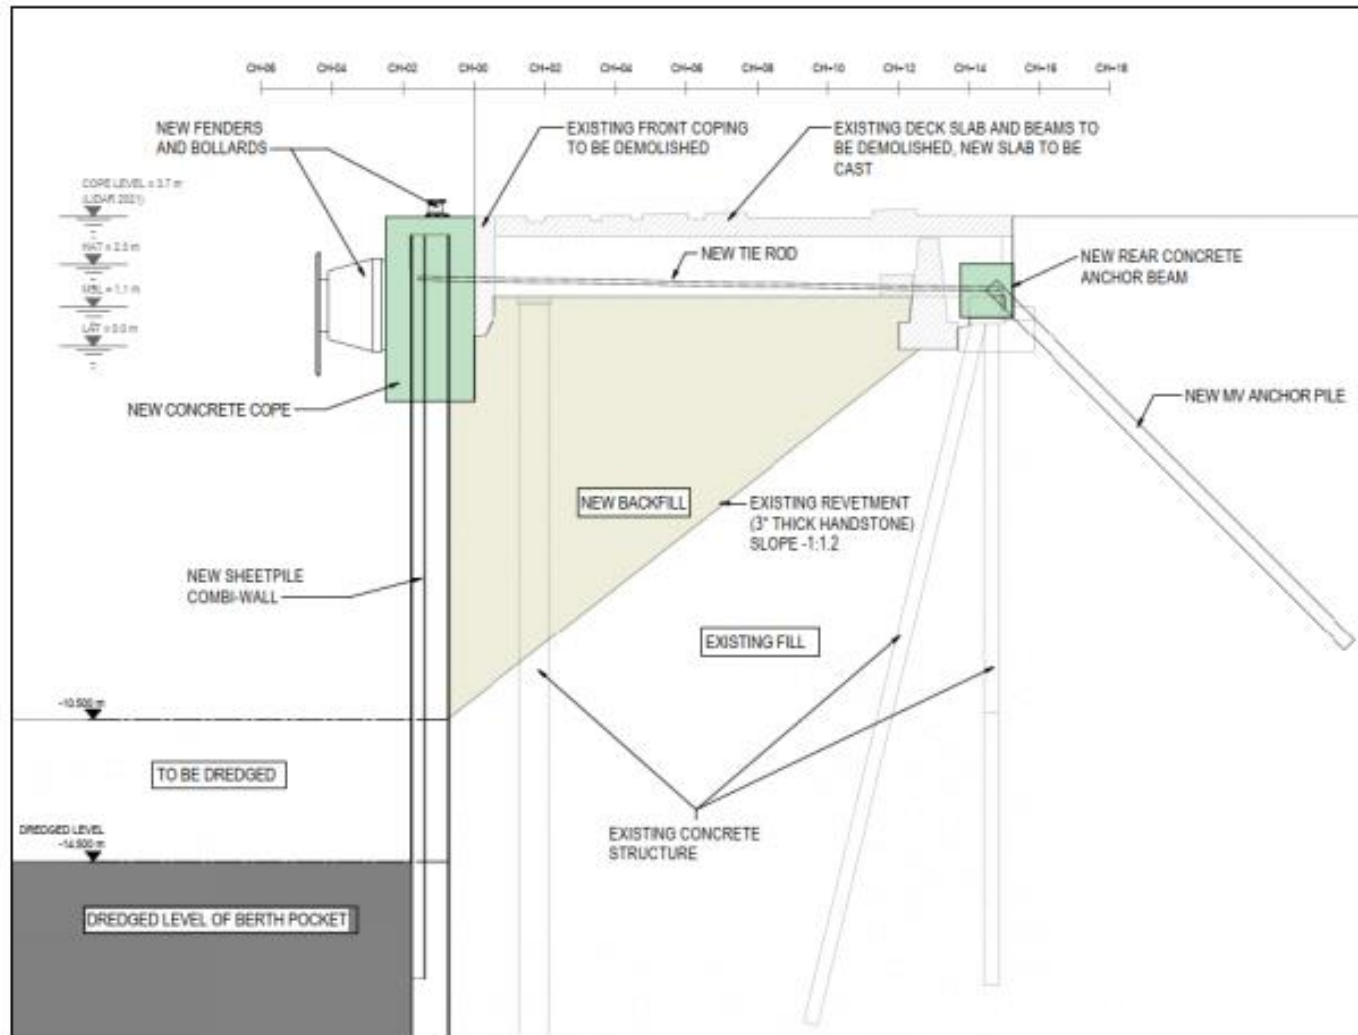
New proposed Berth 6, 7, 9, 10 & 11 Layout
